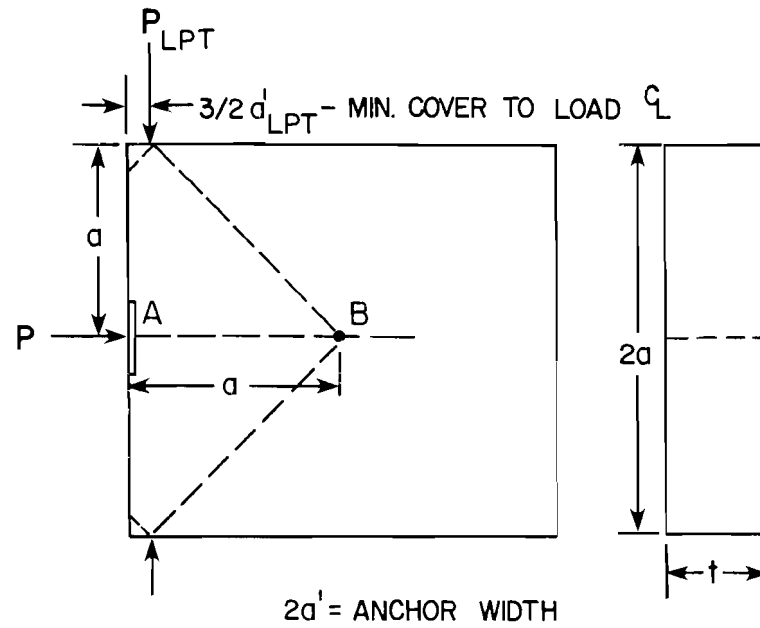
Anchorage zone reinforcement design as per Guyon (from Ref. 5)
